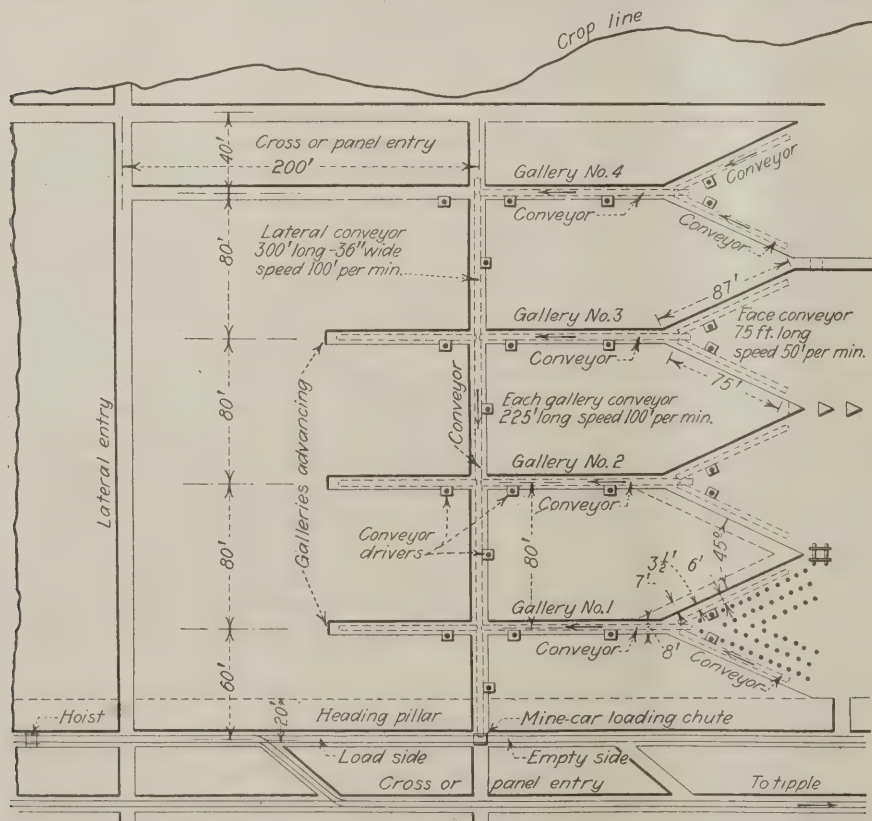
Working Method, Pillar Protection and Conveyor Layout
